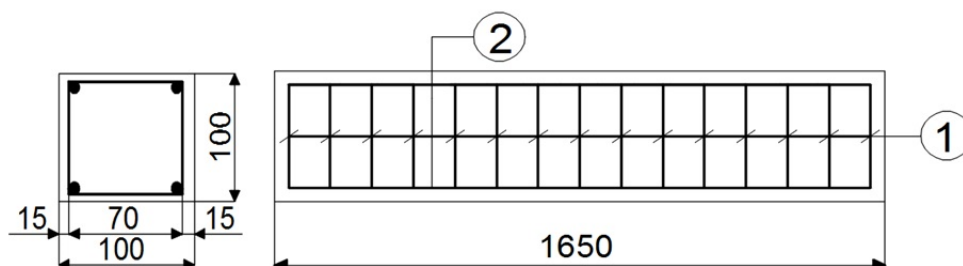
Scheme of the reinforcement of ferroconcrete beams:
